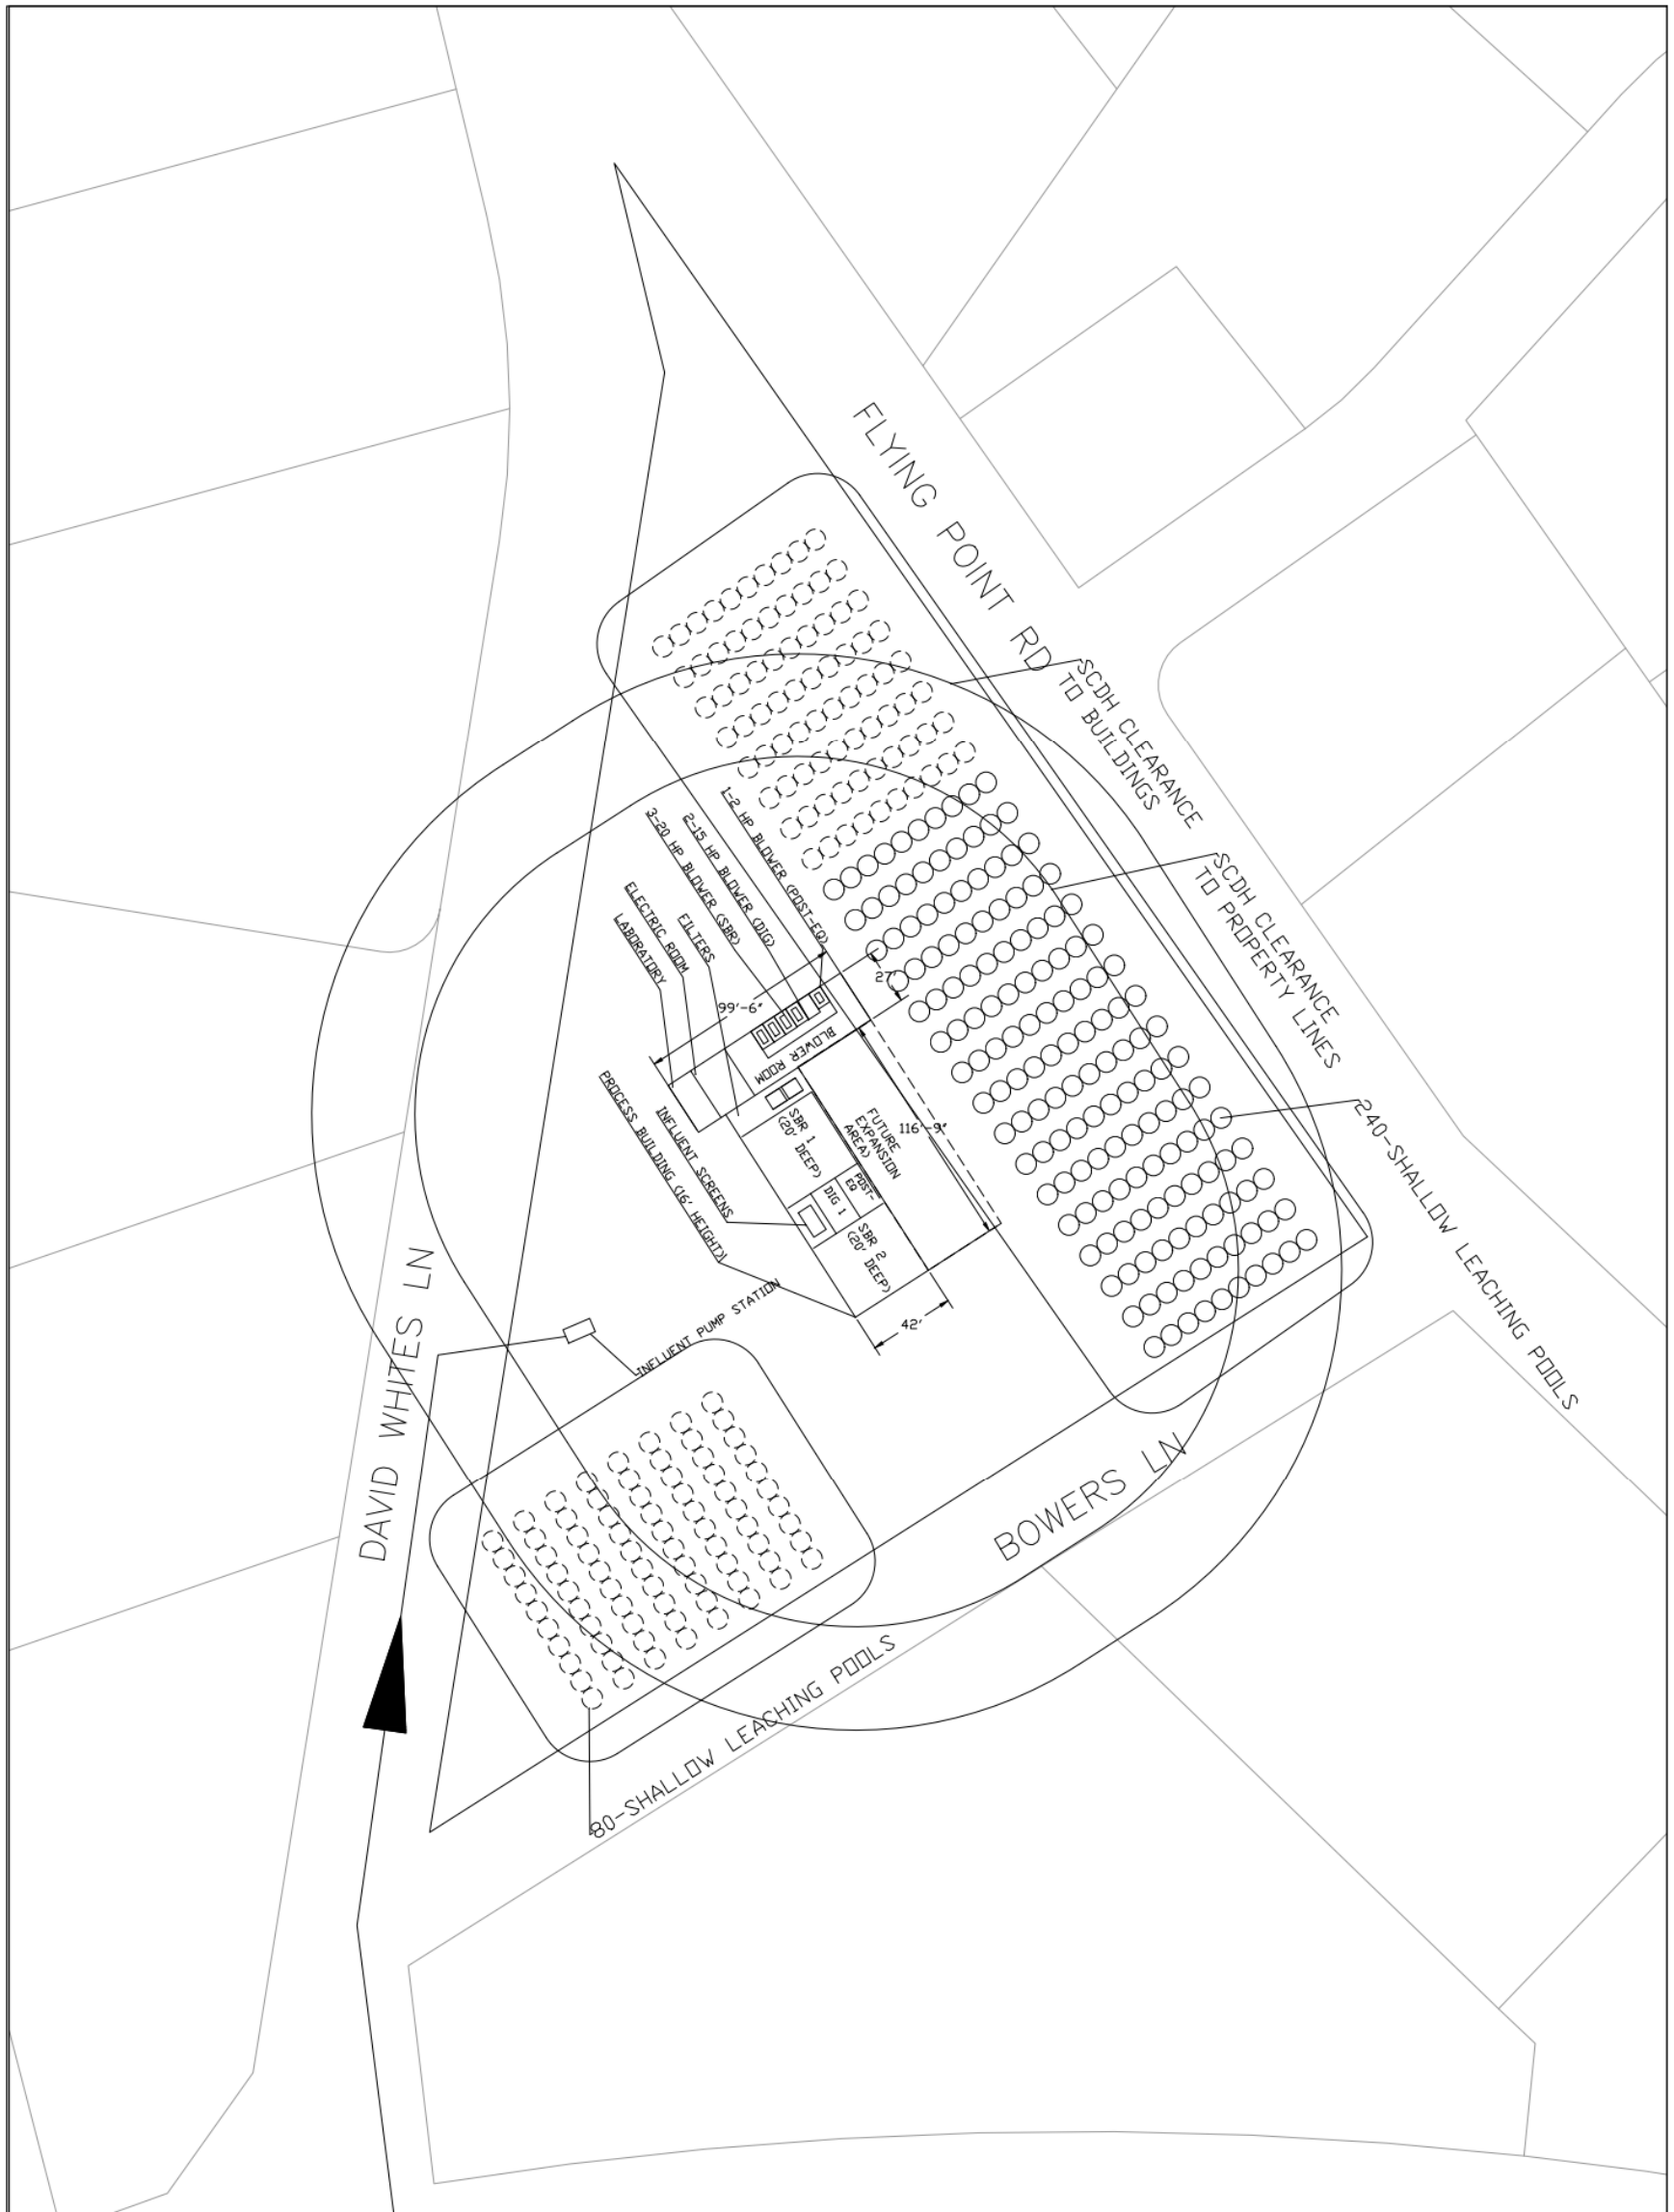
Southampton Wastewater Treatment Conceptual Layout
